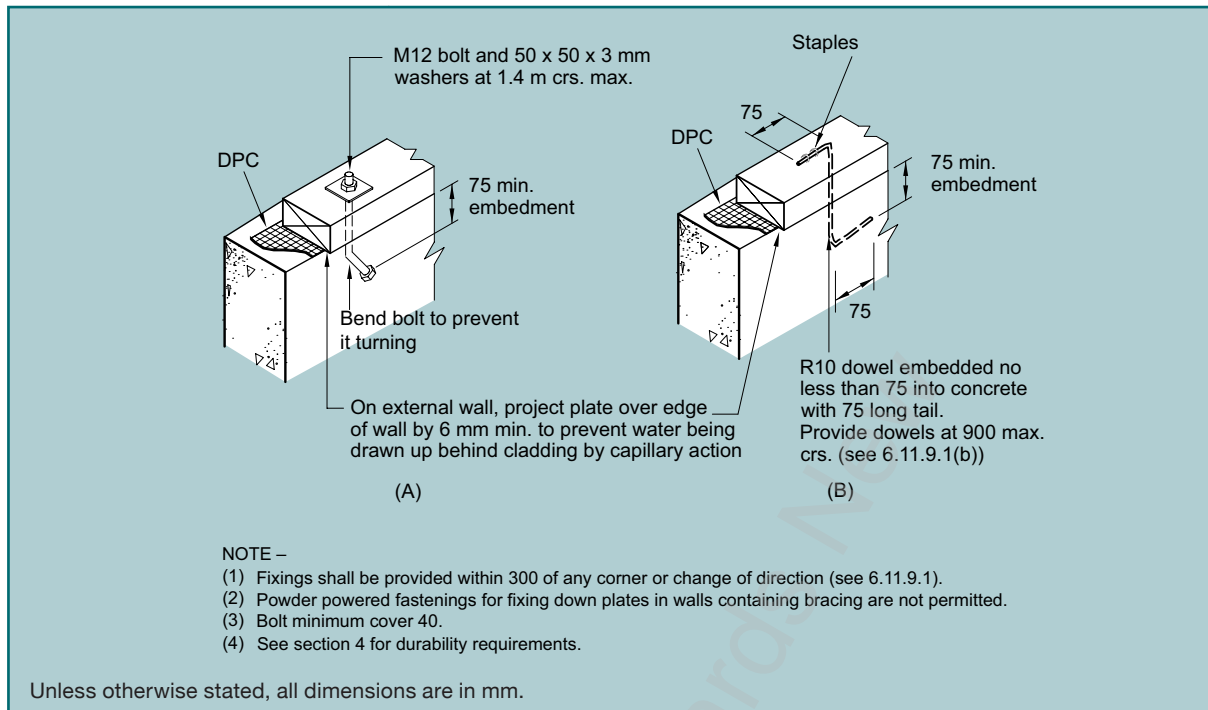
Fixing of wall plates to foundation walls (see 6.11.9)
